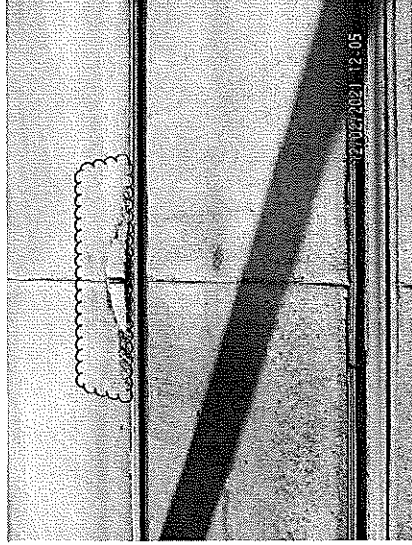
CEDAR ST. BRIDGE OVER I-35E
